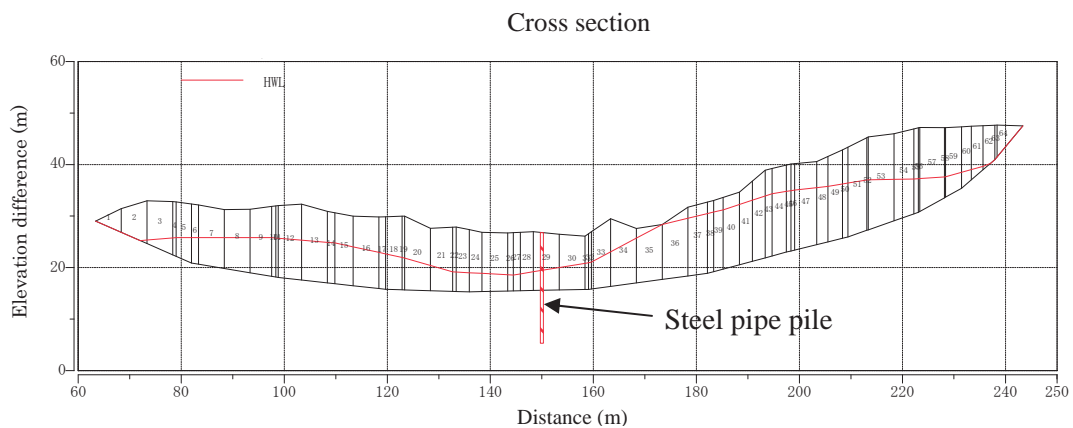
Longitudinal section for trial calculation of effect evaluation with steel pipe piles
